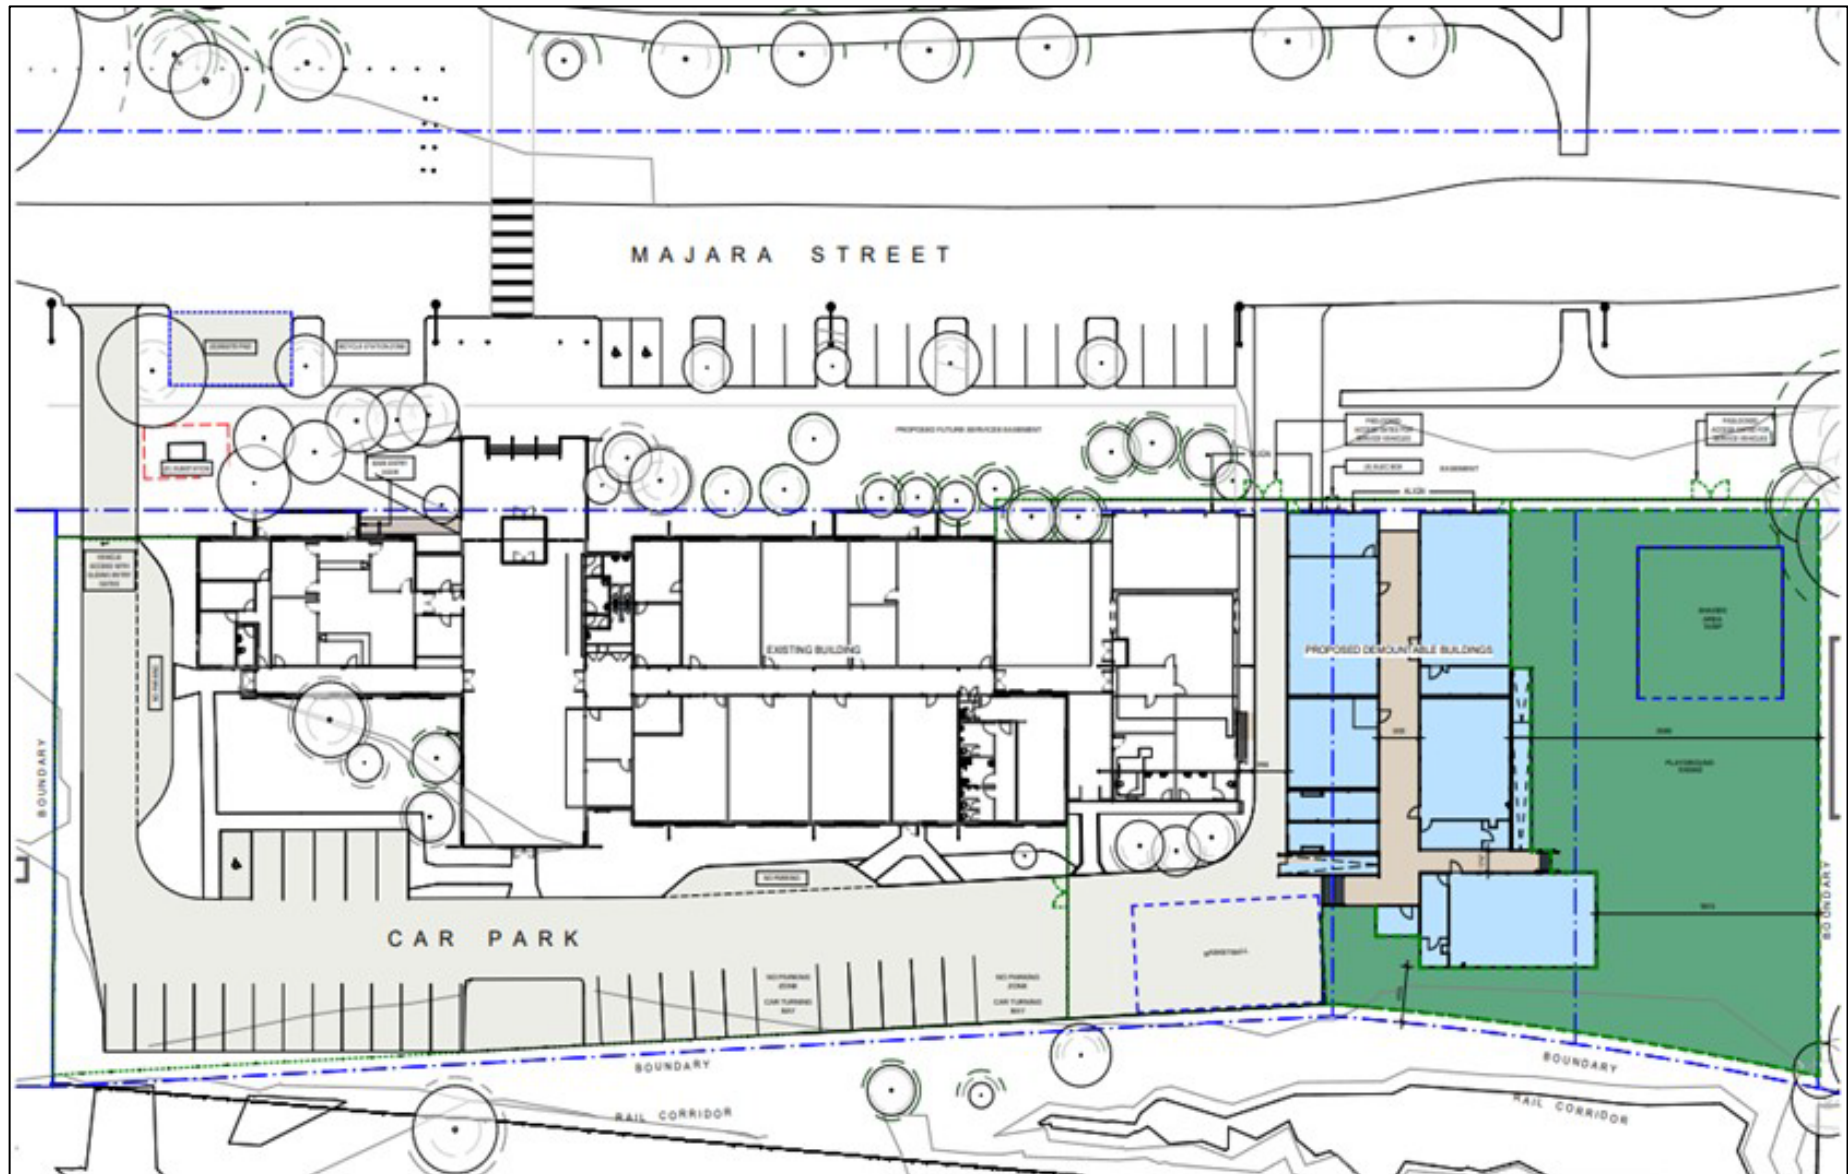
Overall Campus Plan Site and Roof Plan (Source TKD, 2025)
